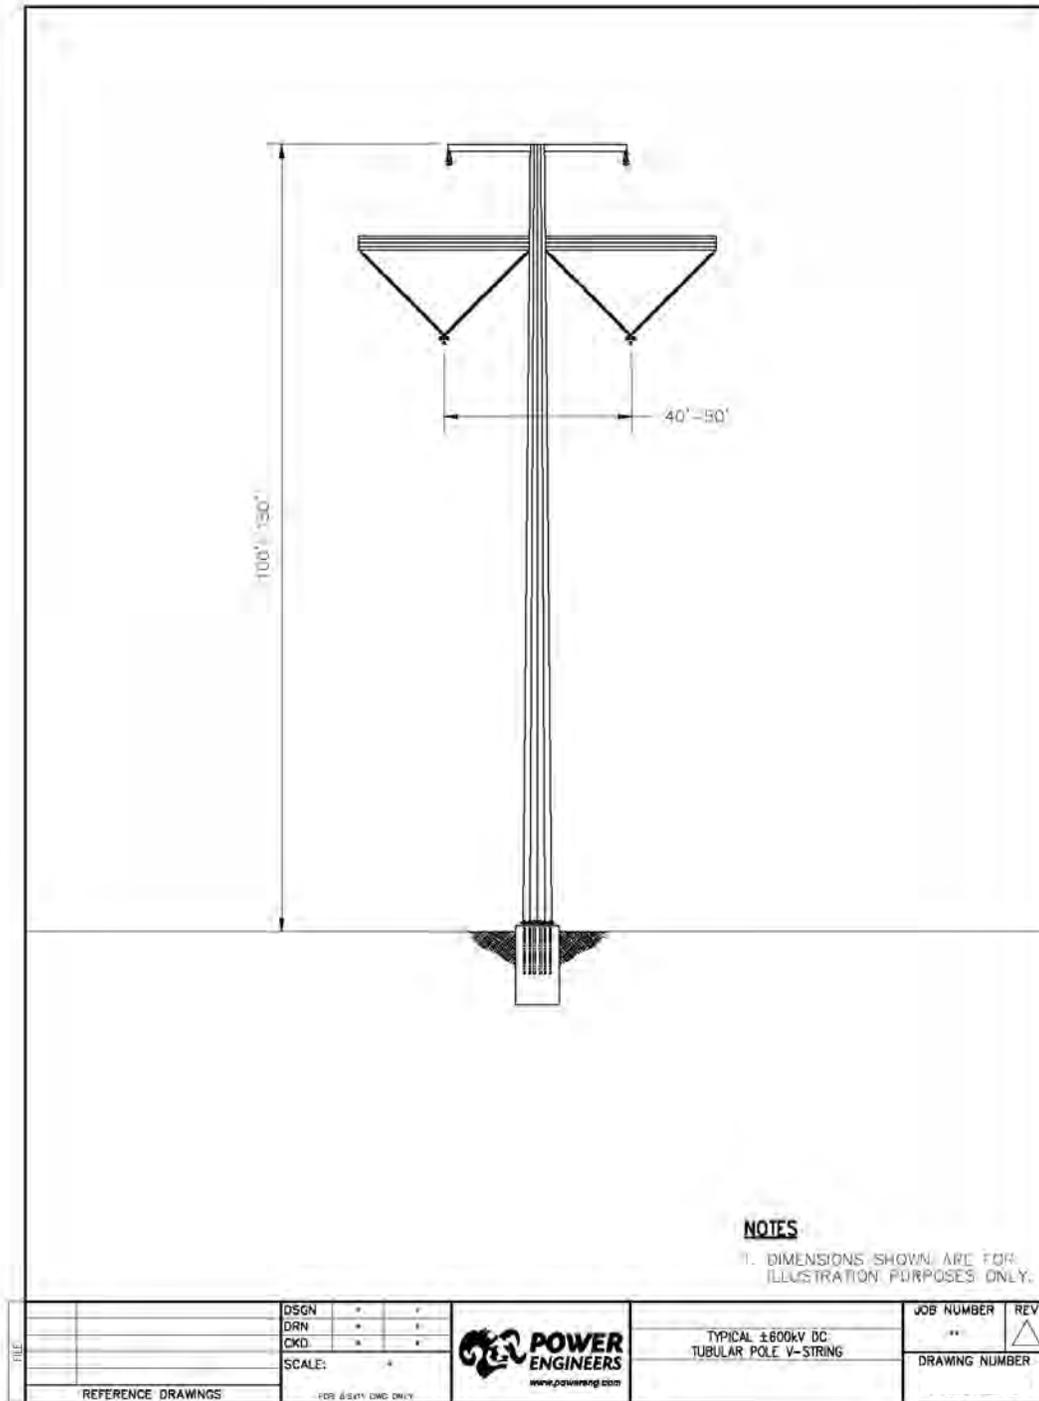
Alternative Structure Design - Typical 600 kV DC Tubular Steel Pole V-String Structure
